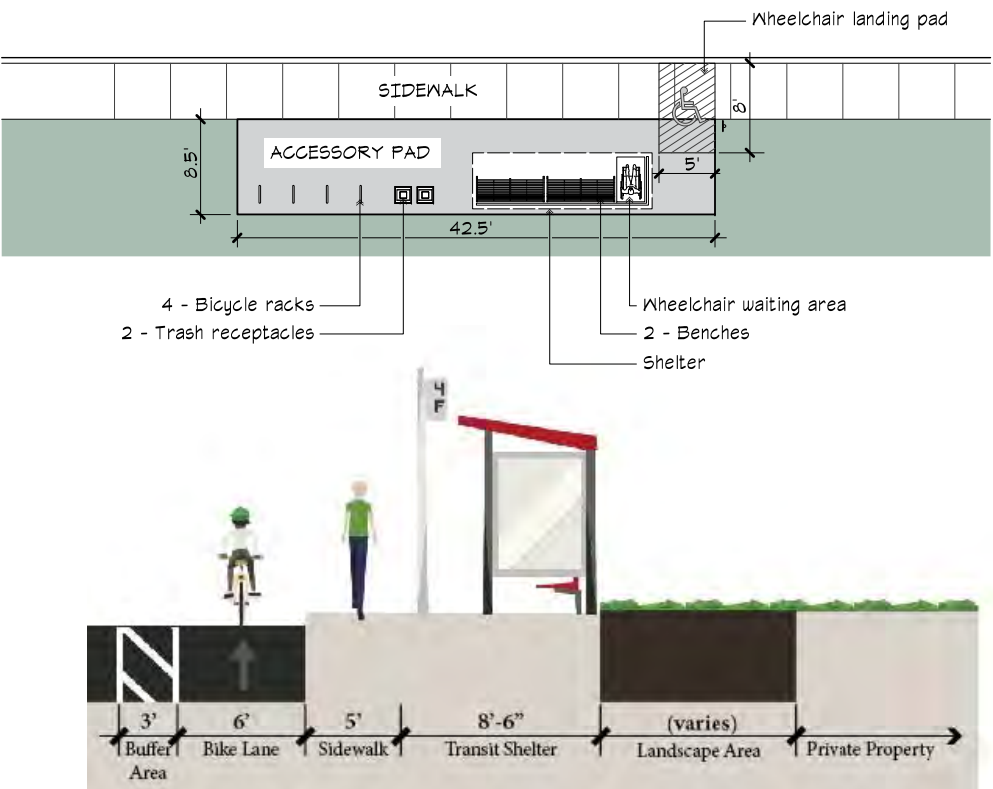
Transit Shelter with Sidewalk Adjacent to the Roadway
